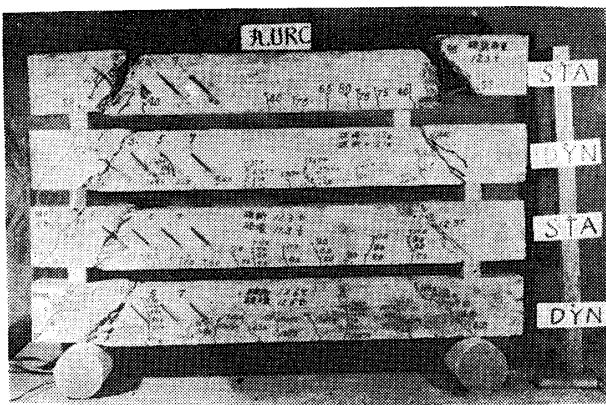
a Left side crack of URC steel bar beam Photo.2 b Right side crack of URC steel bar beam
